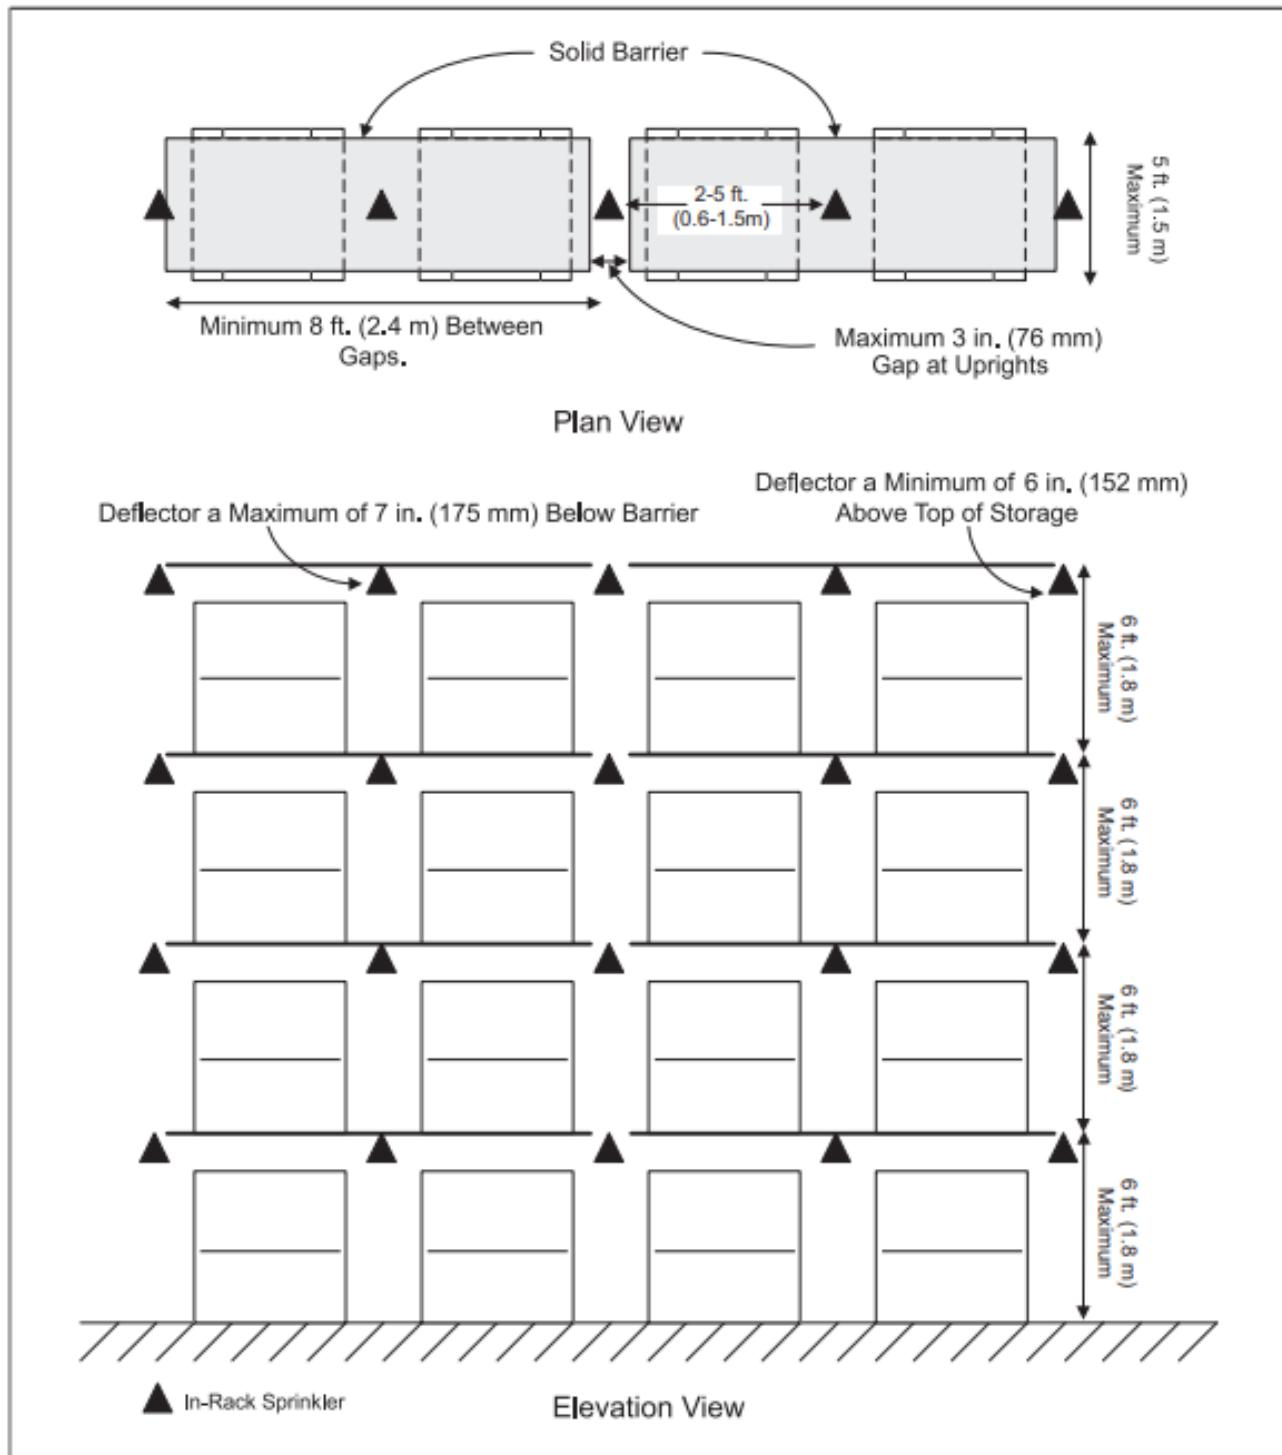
Single-row rack in-rack sprinkler layout for li-ion cells/modules/batteries
